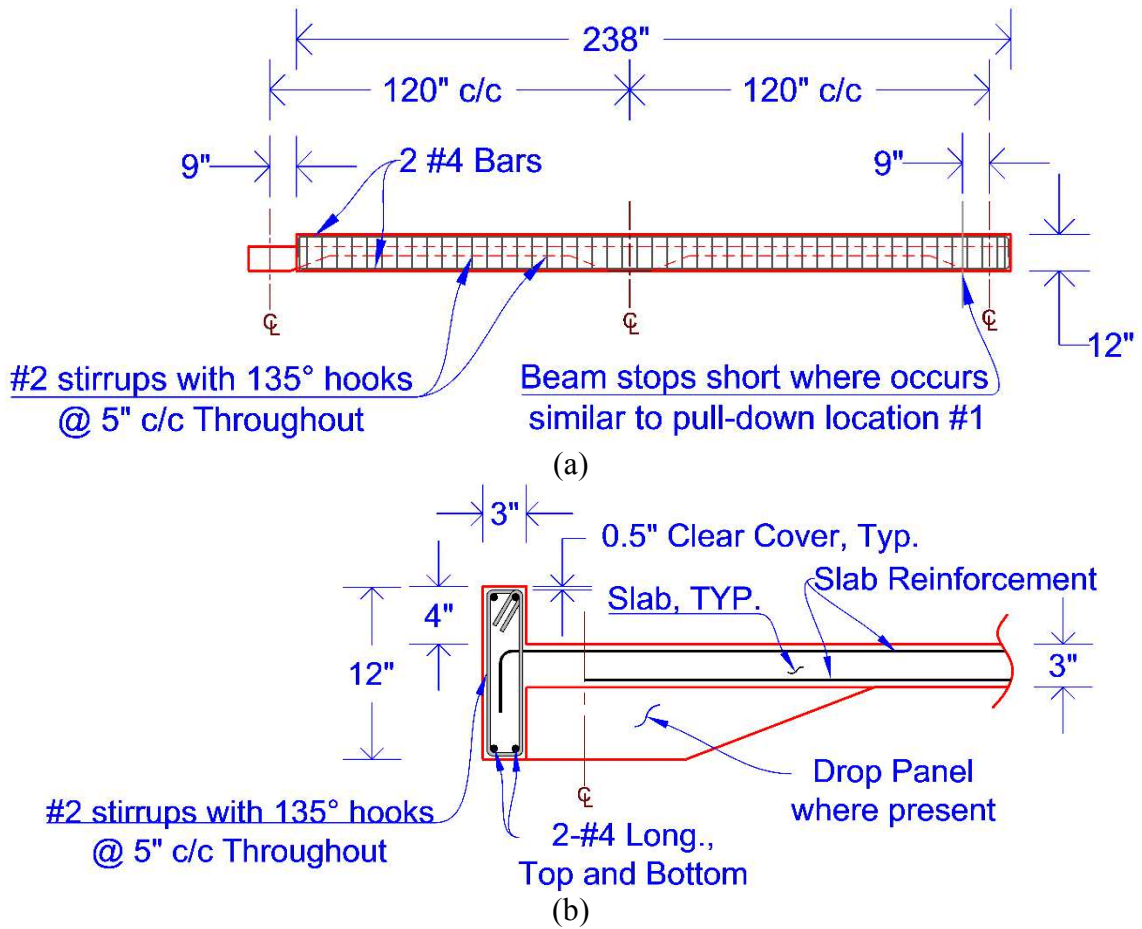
Beam reinforcement, (a) elevation view, (b) cross section view.
